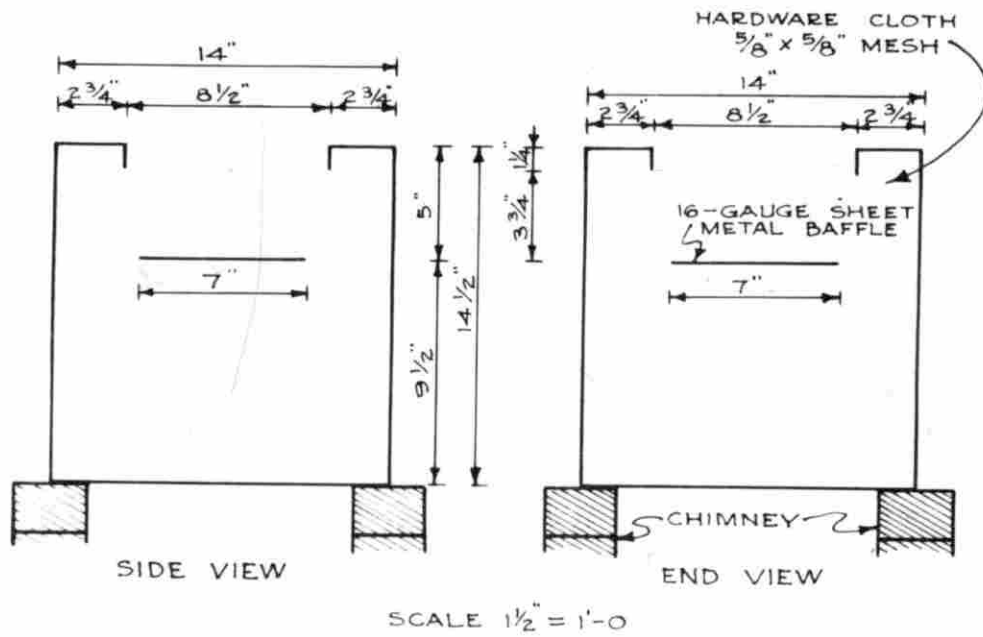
SECTIONAL SKETCH OF NO. 4 SPARK ARRESTER
